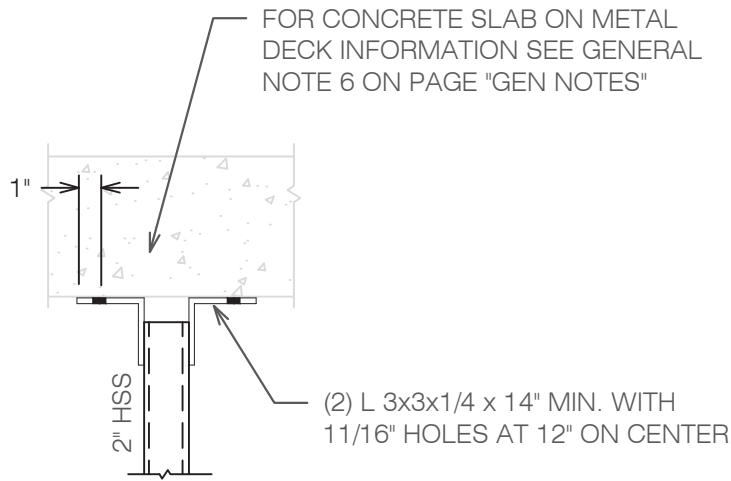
DETAIL FOR VERTICAL CONNECTION AT METAL DECK SLABS
